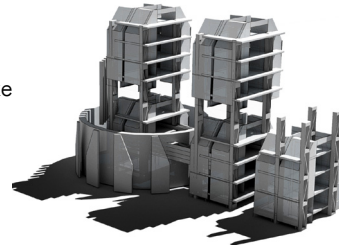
Gateway experiment looking from Brandon Street towards the harbour.
